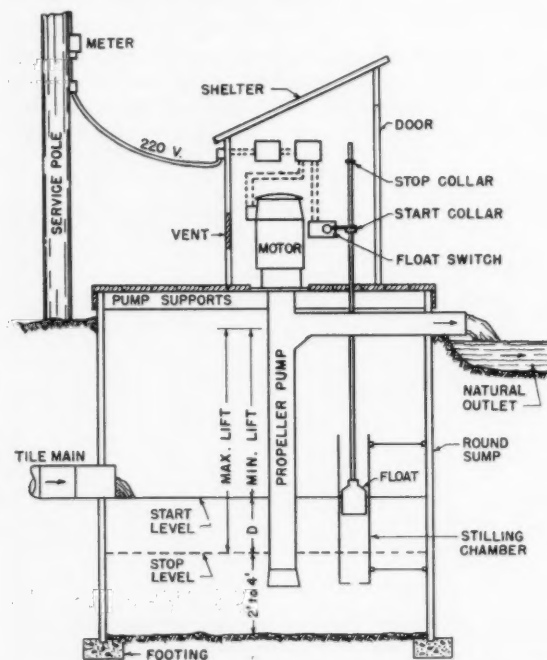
Arrangement of an automatic drainage pumping plant serving as a tile outlet
